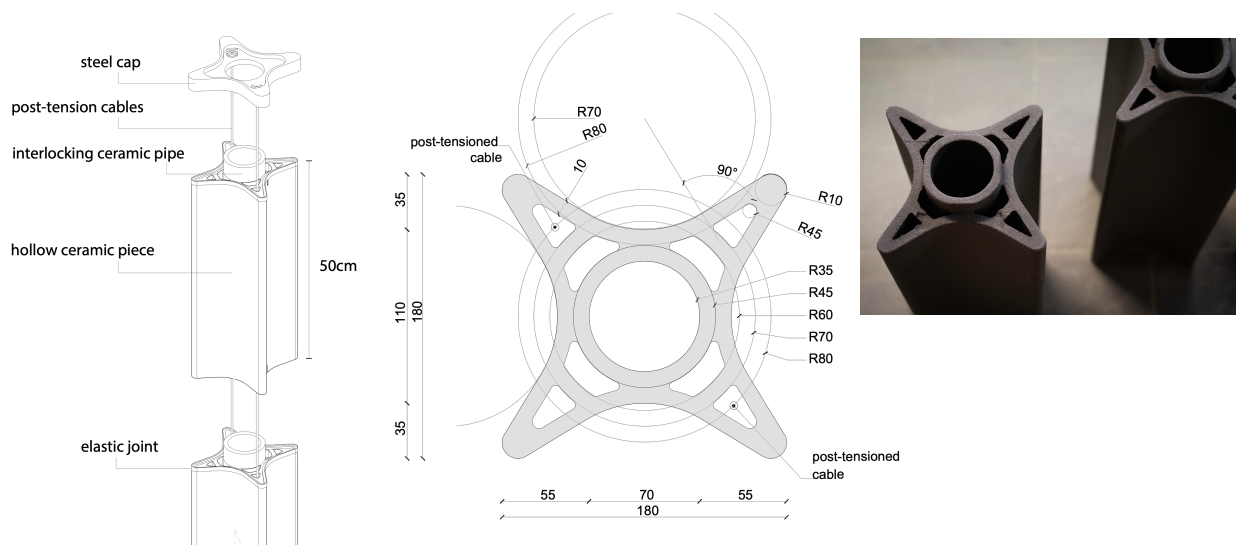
“Stem I” piece. Left: axonometry of column assembly, center: cross-section and geometry of the final piece, right: image of final piece [drawings: Beixi Zhu and Silvia Fernandez Diaz, photo: Frau Recerques Audiovisuals].
